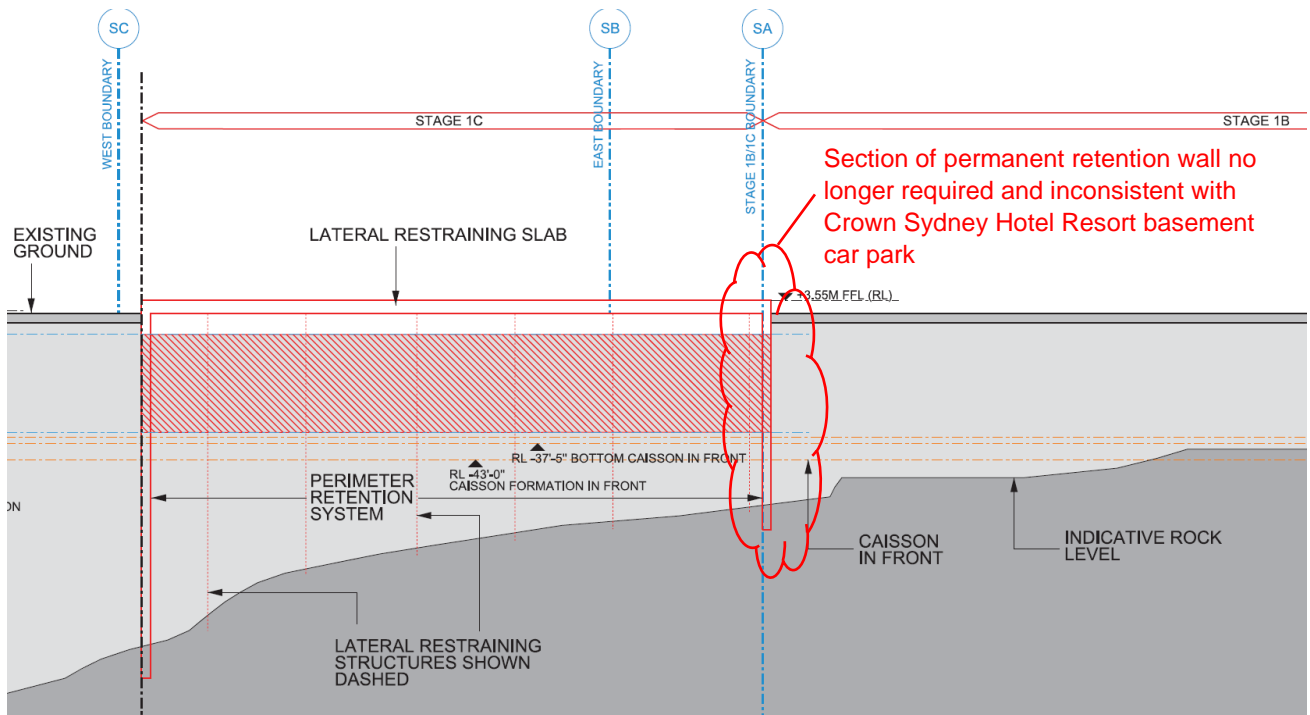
Approved extent of Stage 1C retention wall system and excavation area (Section 2)
